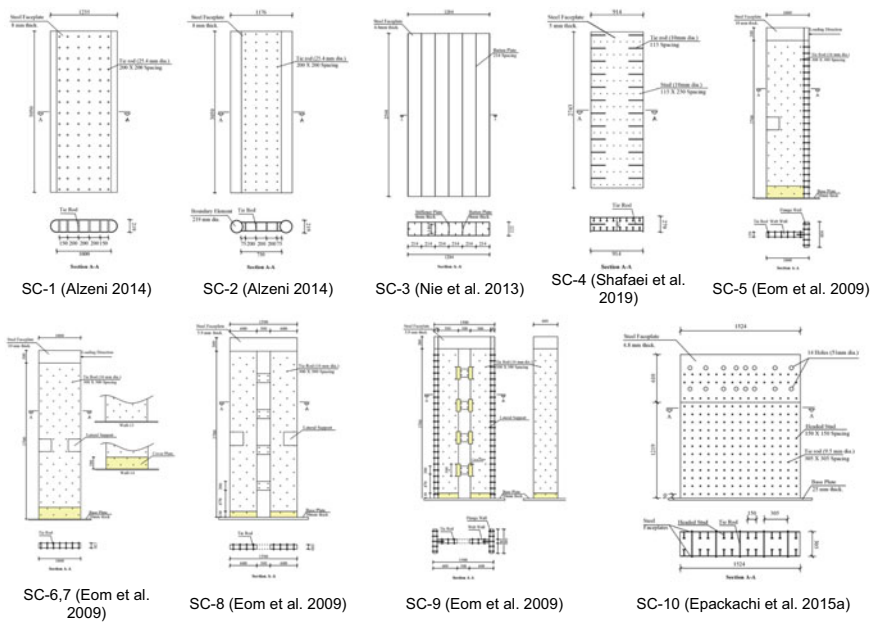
Elevation and cross-sectional views of SC walls (all values in mm)
